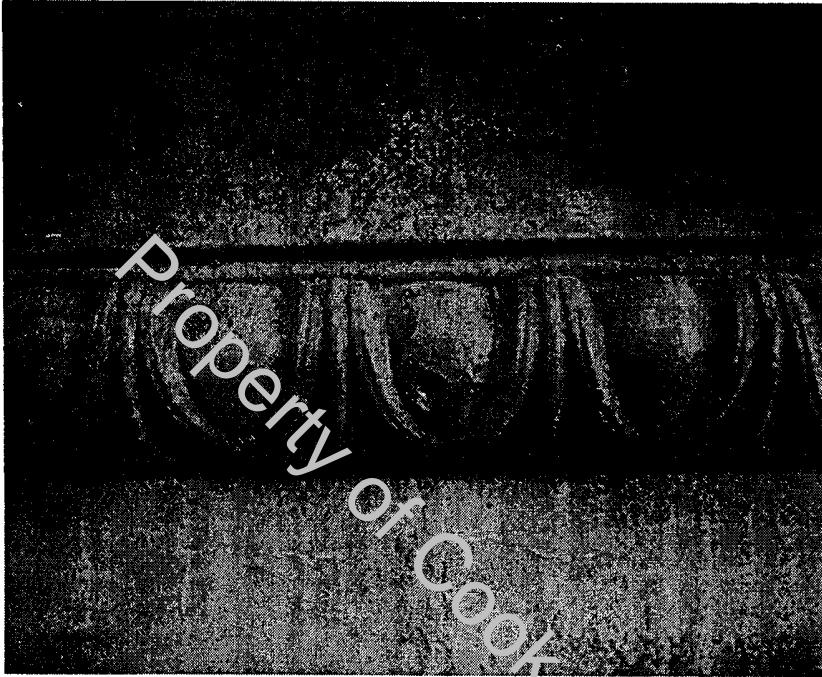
Sheet metal egg and dart molding on sheet metal cornice. Note hole in ornamental piece which appears to be related to impact. The sheet metal components are easily damaged by impact. Loose sections of the molding were removed at the time of our inspection. The perimeter of the molding was typically sealed to the adjacent sheet metal with sealant.
